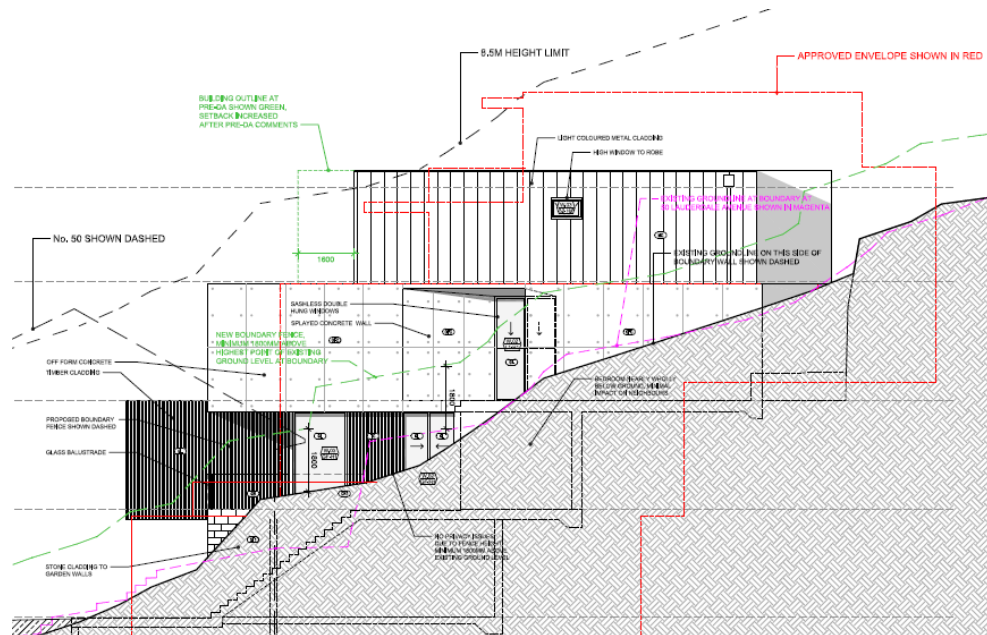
Plan extract Eastern Elevation showing minor 8.5m height breach
